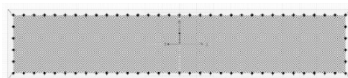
Fiber cross-section of a 14 m long pier of RC girder bridge
